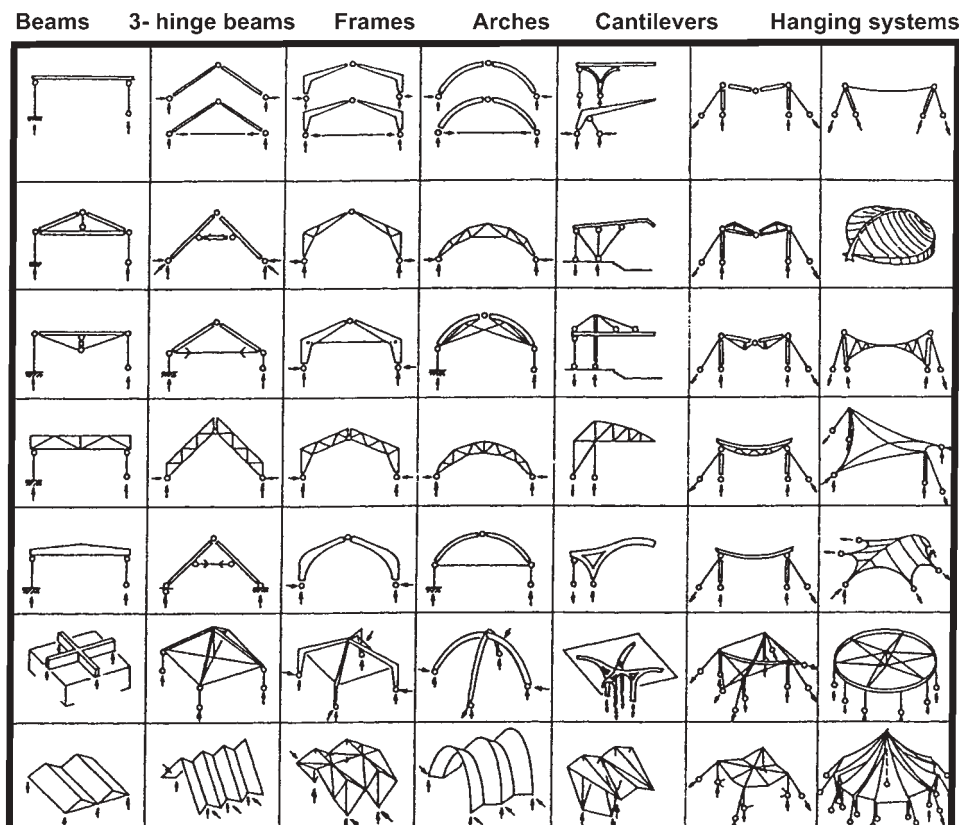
Wood structural systems: Beams – 3-hinge beams – Frames – Arches – Cantilevers – Hanging systems (Winter, 2004)
